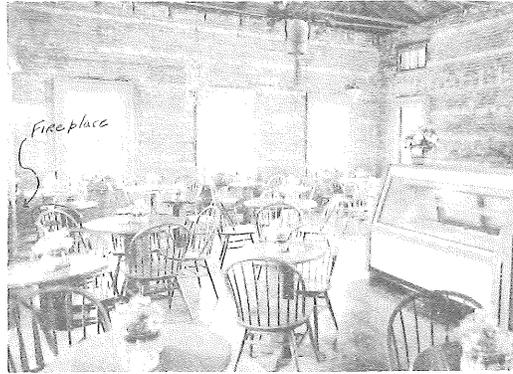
Brick walls were exposed and the ceiling was removed in the dining area on the second floor.
